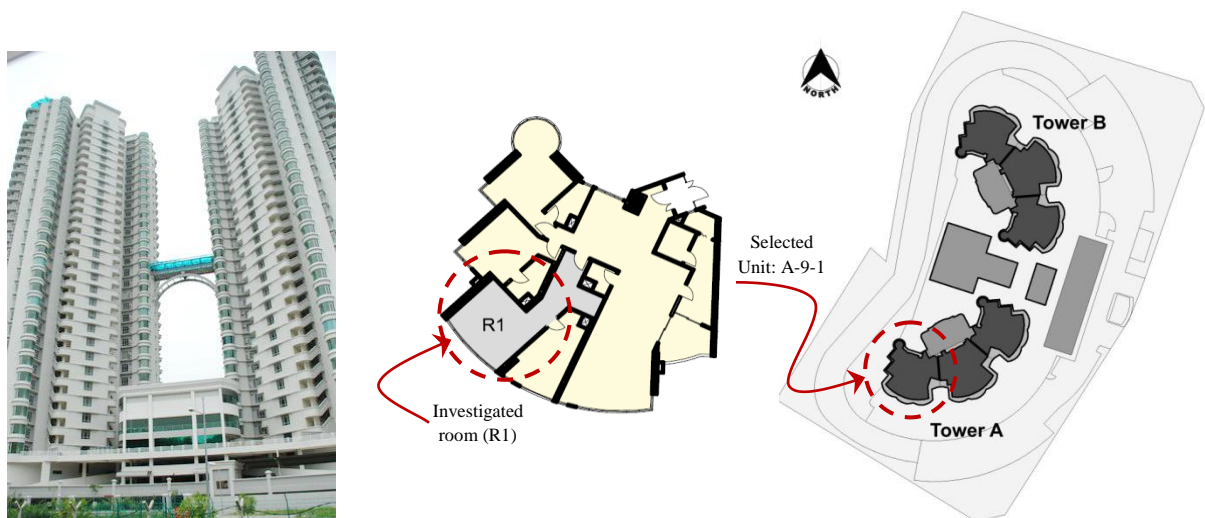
The View (elevation, typical floor plan of the units showed the investigated room), Penang
